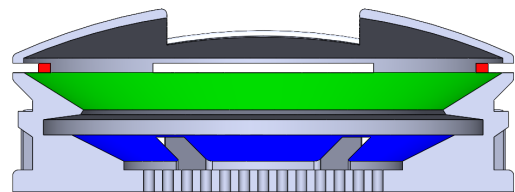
Side view section cut of stadium geometry showing two floor seating (blue and green) and roof slits (red).
